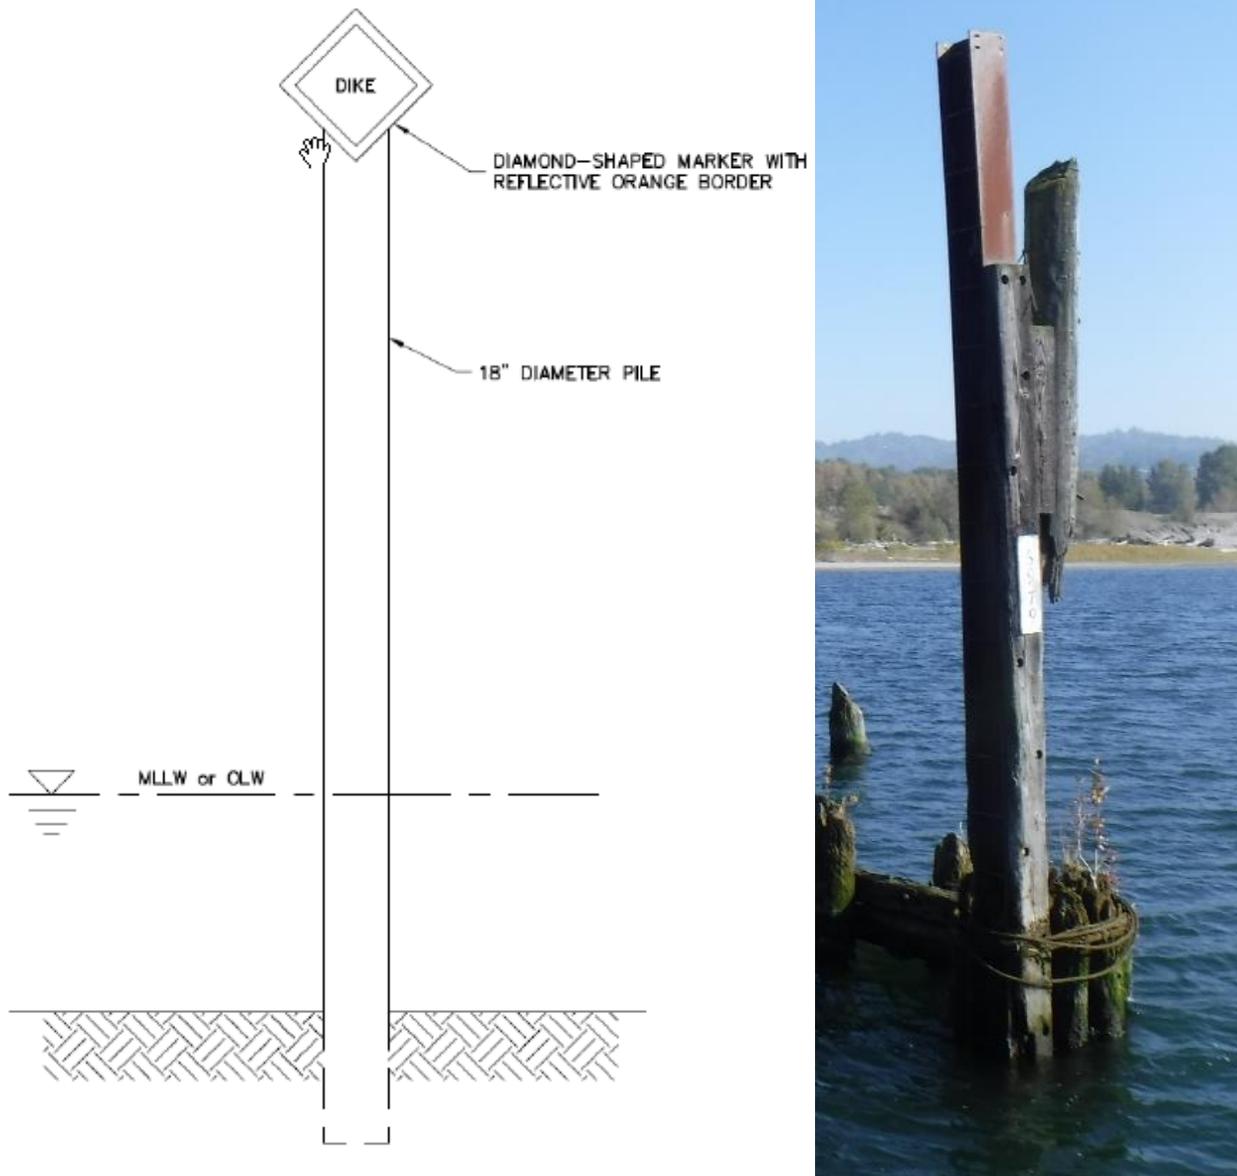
Single vertical timber, steel pipe pile, or steel H-pile marker configuration.
